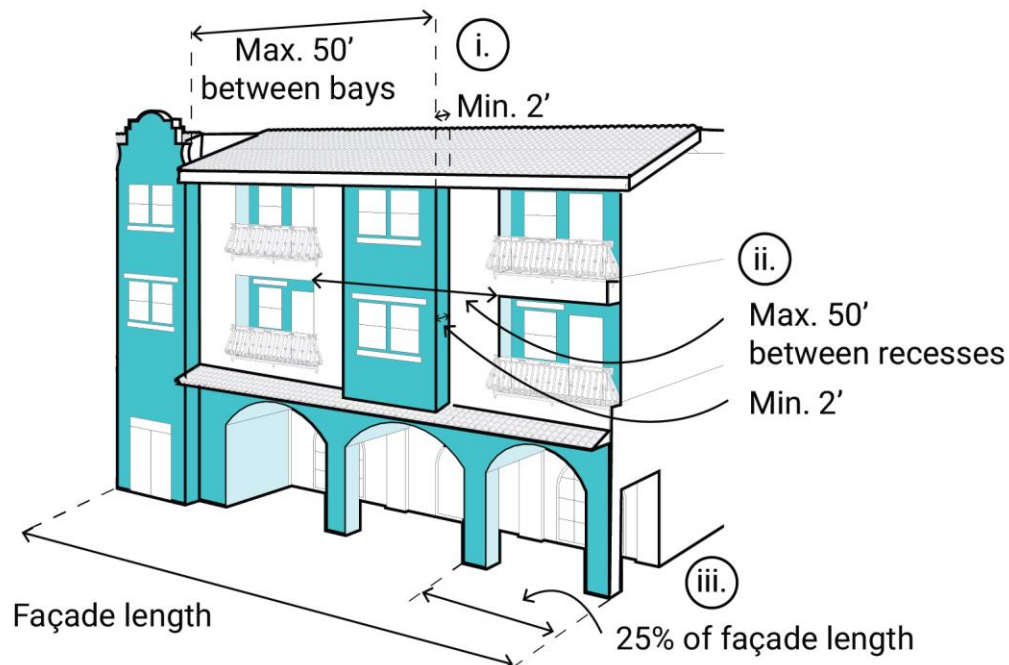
(B)(4)(c): Façades along Mission Boulevard
